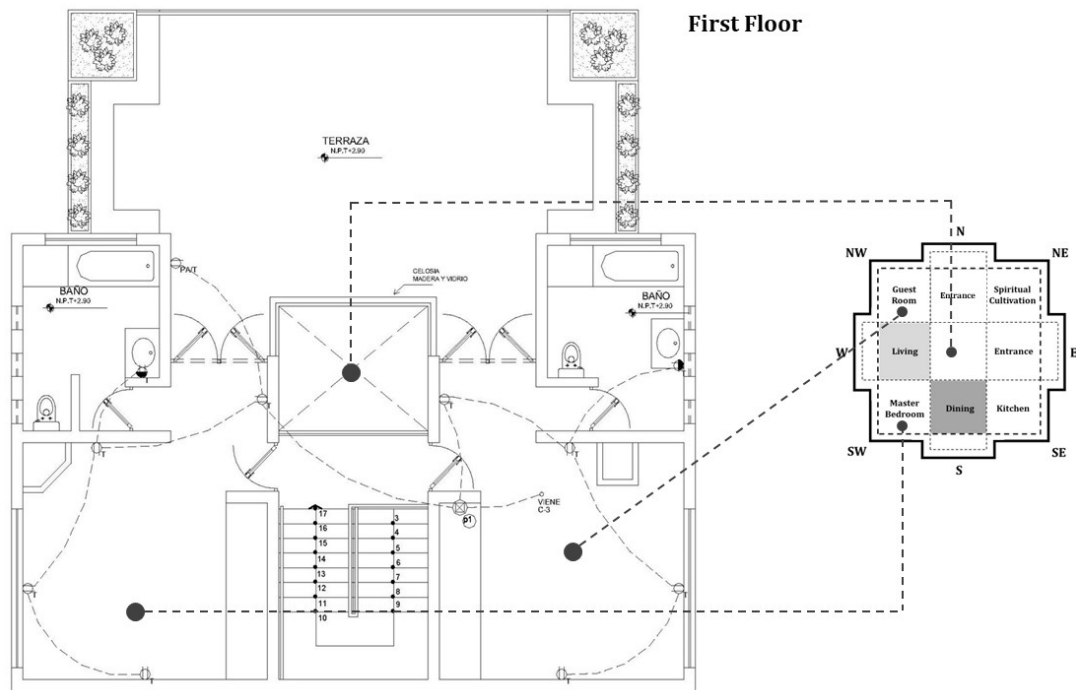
House 2 first floor plan in relation to indicative floor plan of MVA home
